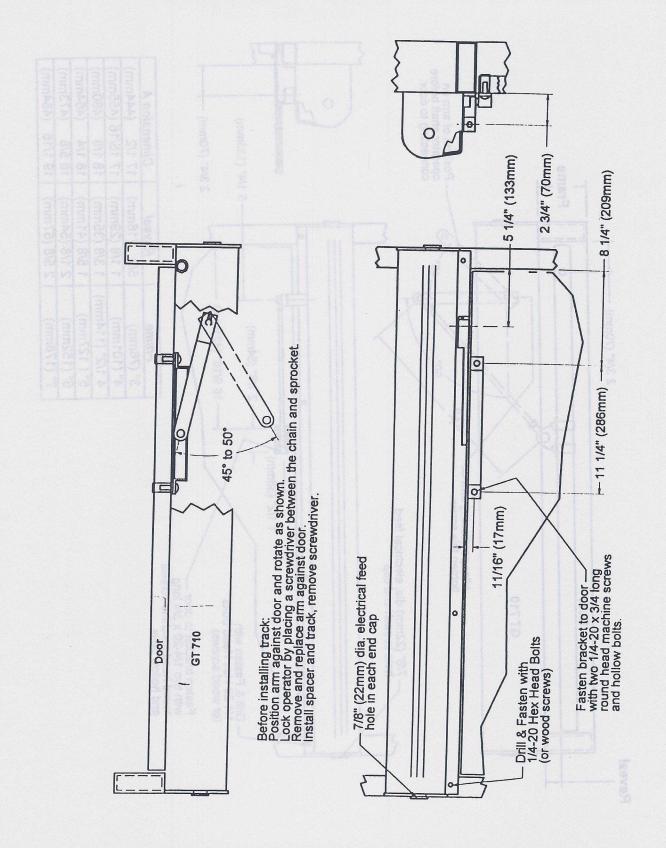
Installation Details, Left Hand Inswing No Reveal.
